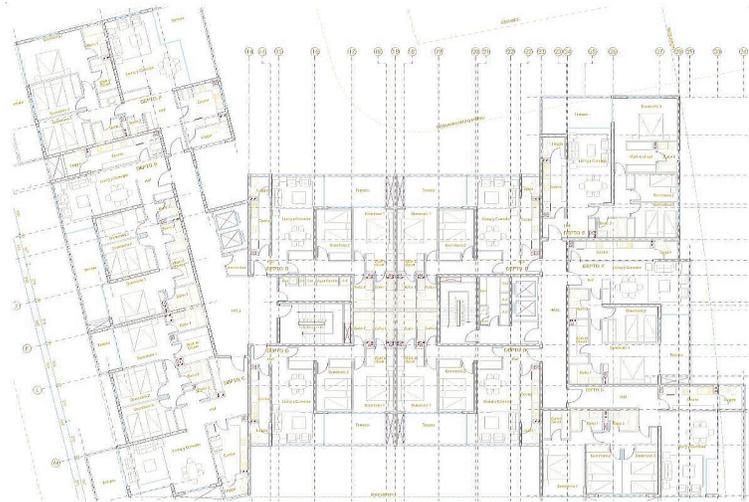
Example of a rasterized multi-unit floor plan [21].
